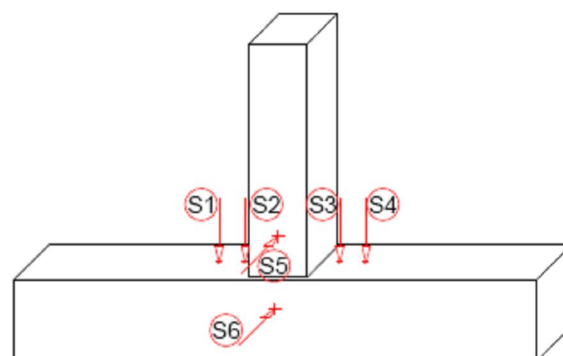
The geometrical arrangement of inductive sensors on a specimen
